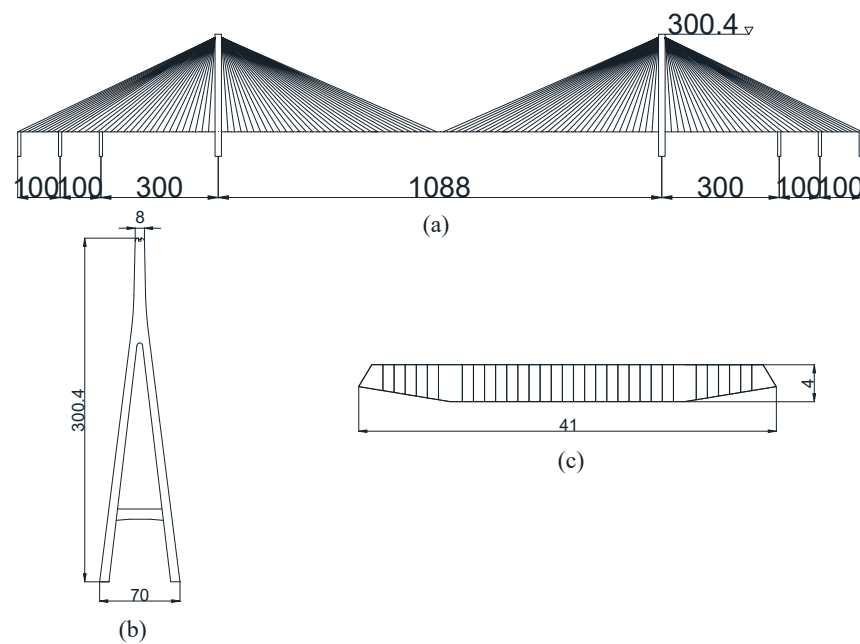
Sutong Bridge structure diagram: (a) layout of the whole bridge; (b) tower; (c) girder.
